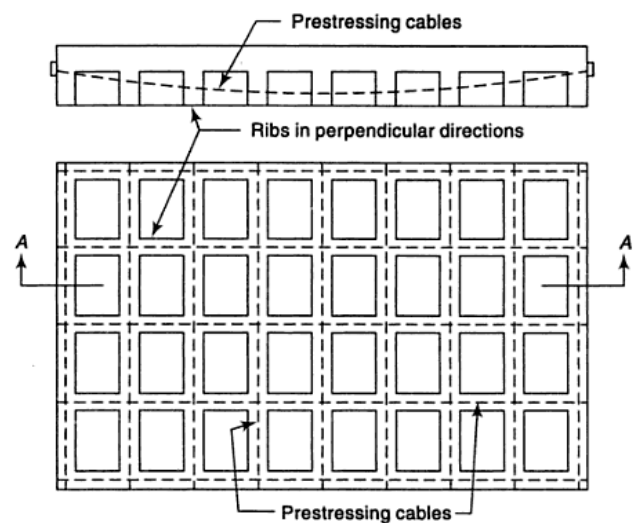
Lift Slab Construction: Prestressed Concrete Grid Floor.
